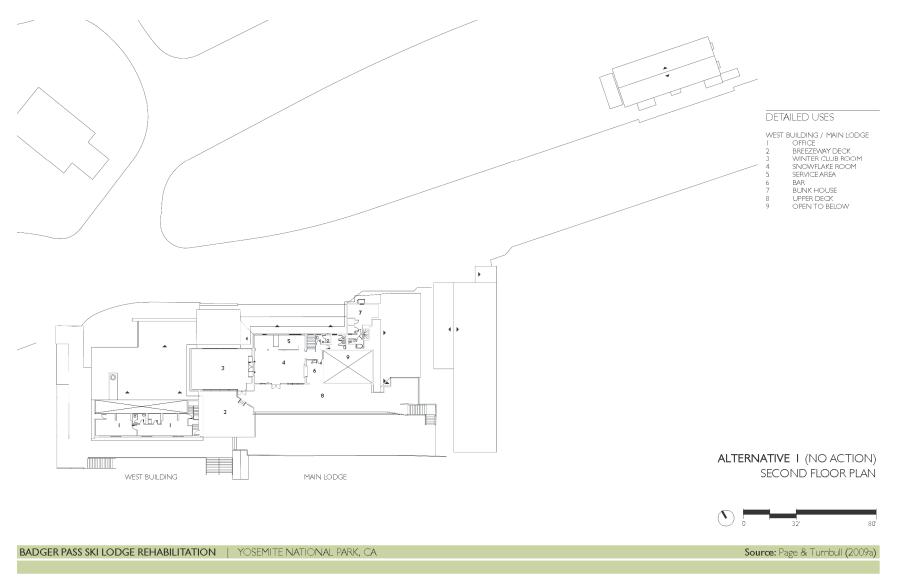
Badger Pass Ski Lodge – Existing Second Floor Plan.
